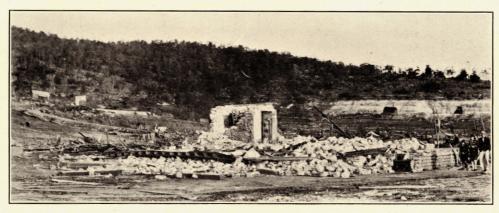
Ruins of the Izard County Bank at Guion, one side and top of vault torn off. Building made of concrete blocks. Photo by Carl Olsson
